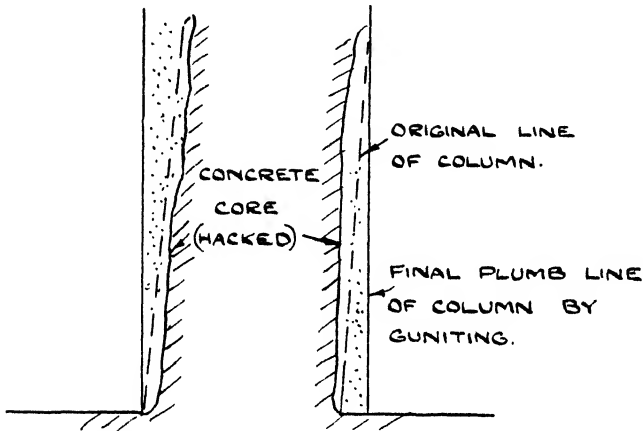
VERTICAL SECTION OF A COLUMN INDICATING METHOD OF RESTORING TO A PLUMB CONDITION
